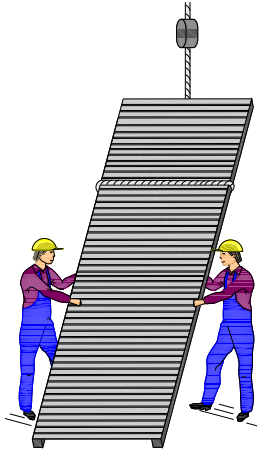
Erecting the side part using a chain block as auxiliary equipment
